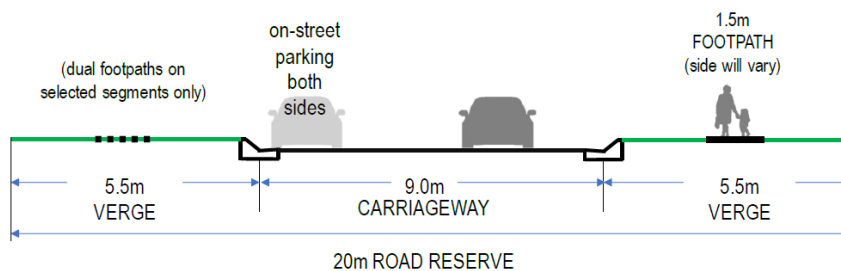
Proposed Collector Road Cross Section (Source: GTA Consultants)
